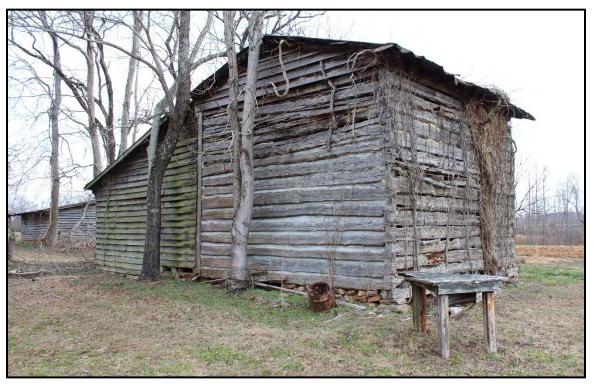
RK1758 granary and tractor shed; view is southeast featuring the northwest (rear) and southwest elevation.
